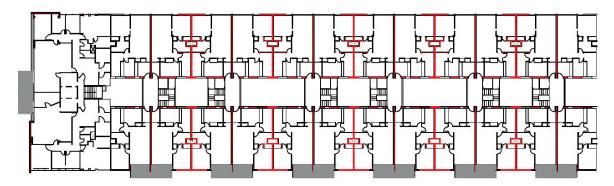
F. Barba Corsini. Mitre block of flat. Scale 1:500. Redraw M. Lucchini.
